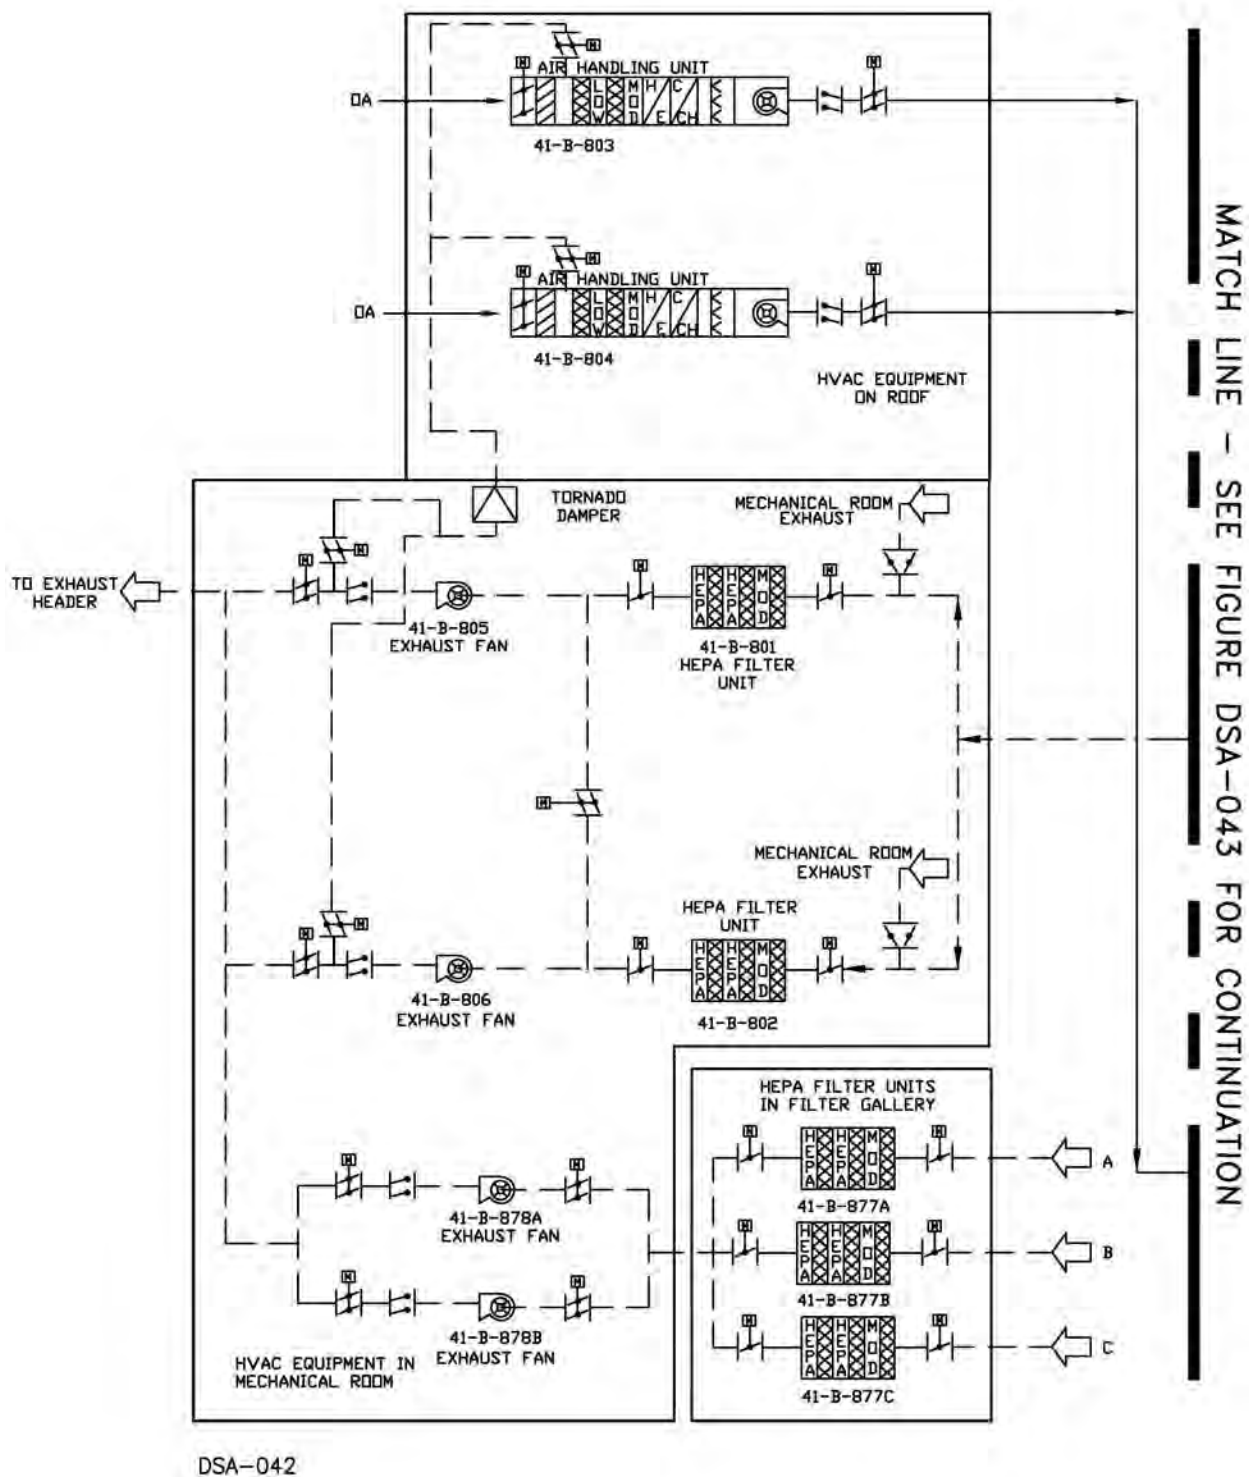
Waste Handling Building Remote-Handled HVAC Flow Diagram
